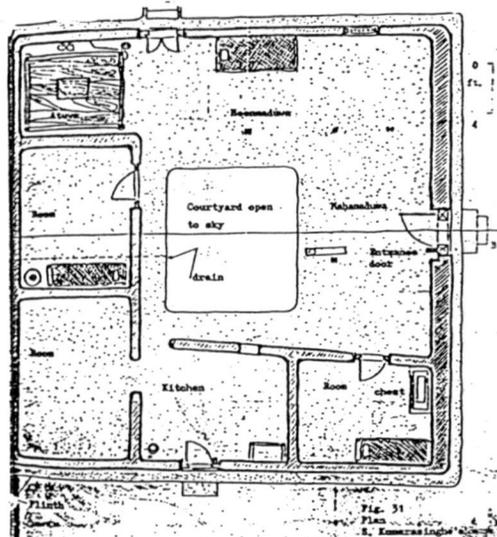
Plan of Sujatha kumariham's House, Dullawa
